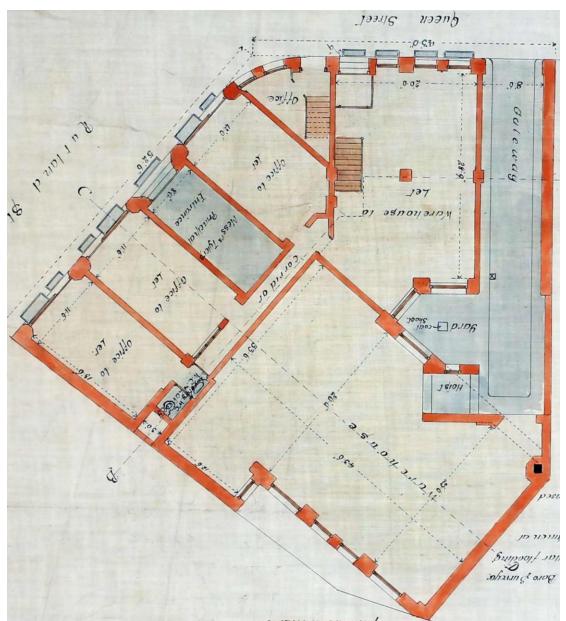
Detail of ground floor plan from the 1897 proposals ROLLR 1897/4848. North approximately to top of page
